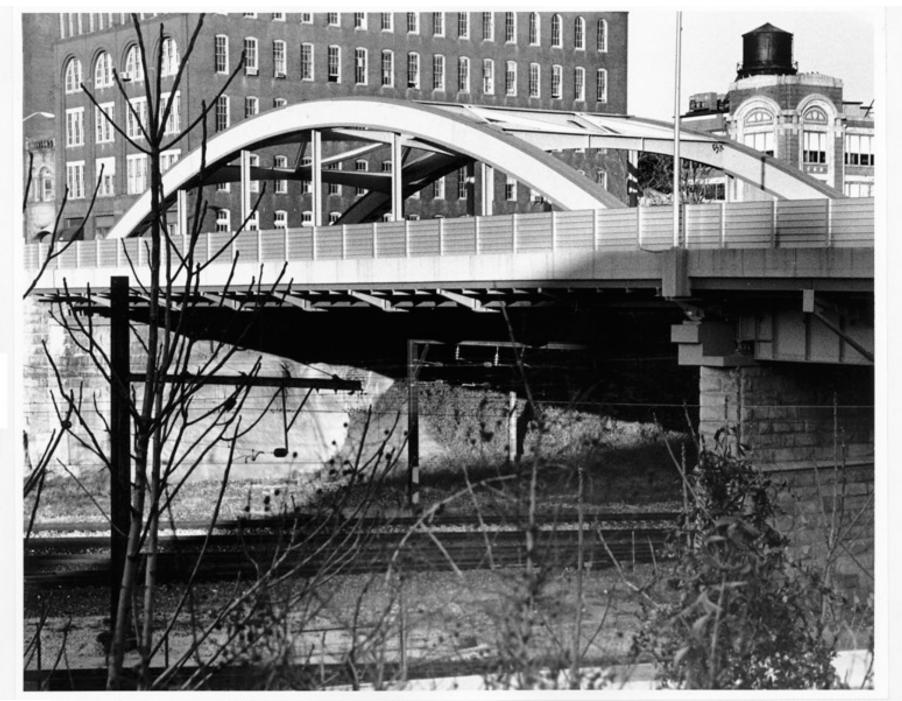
Typical Metal Arch Bridge: Bridge on Guilford Avenue in Baltimore
